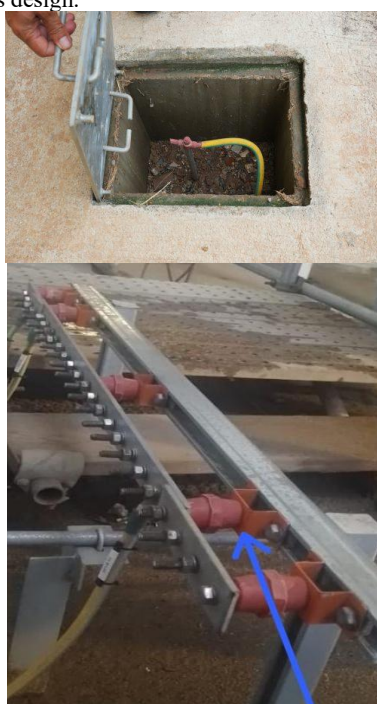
Grounding Rod and Earth Pit Installation, Workshop 3 & 4, PT VME Process
